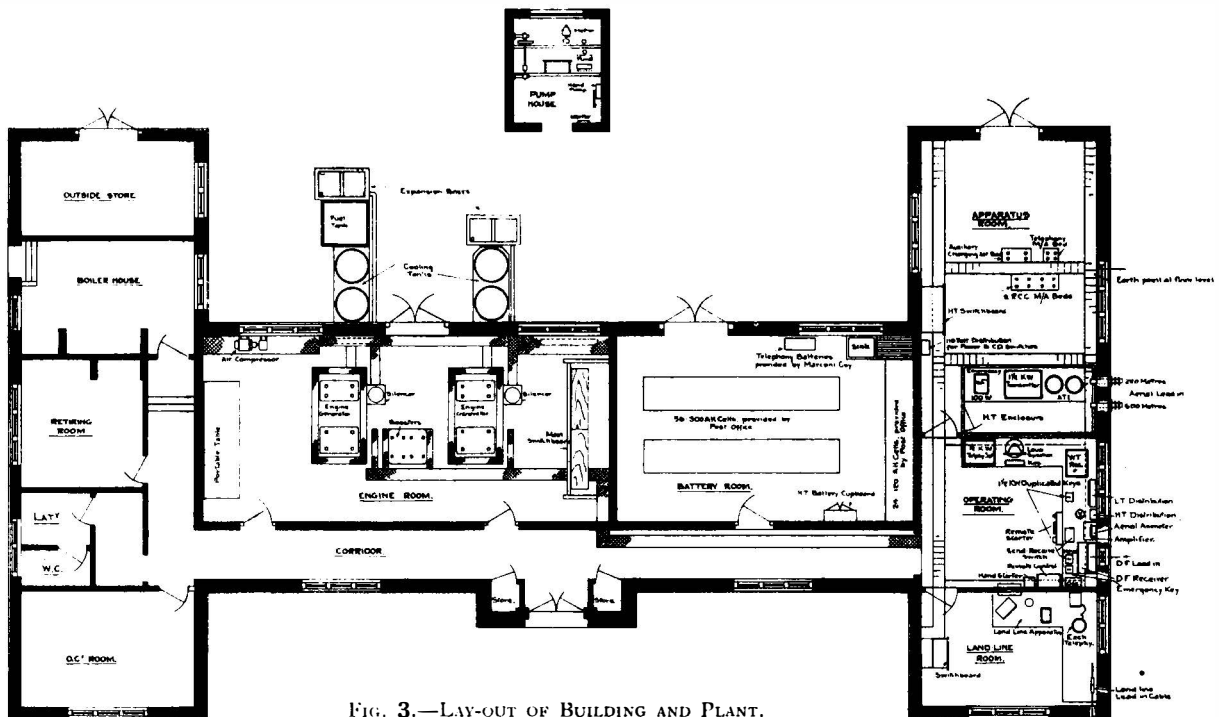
LAY-OUT OF BUILDING AND PLANT.
